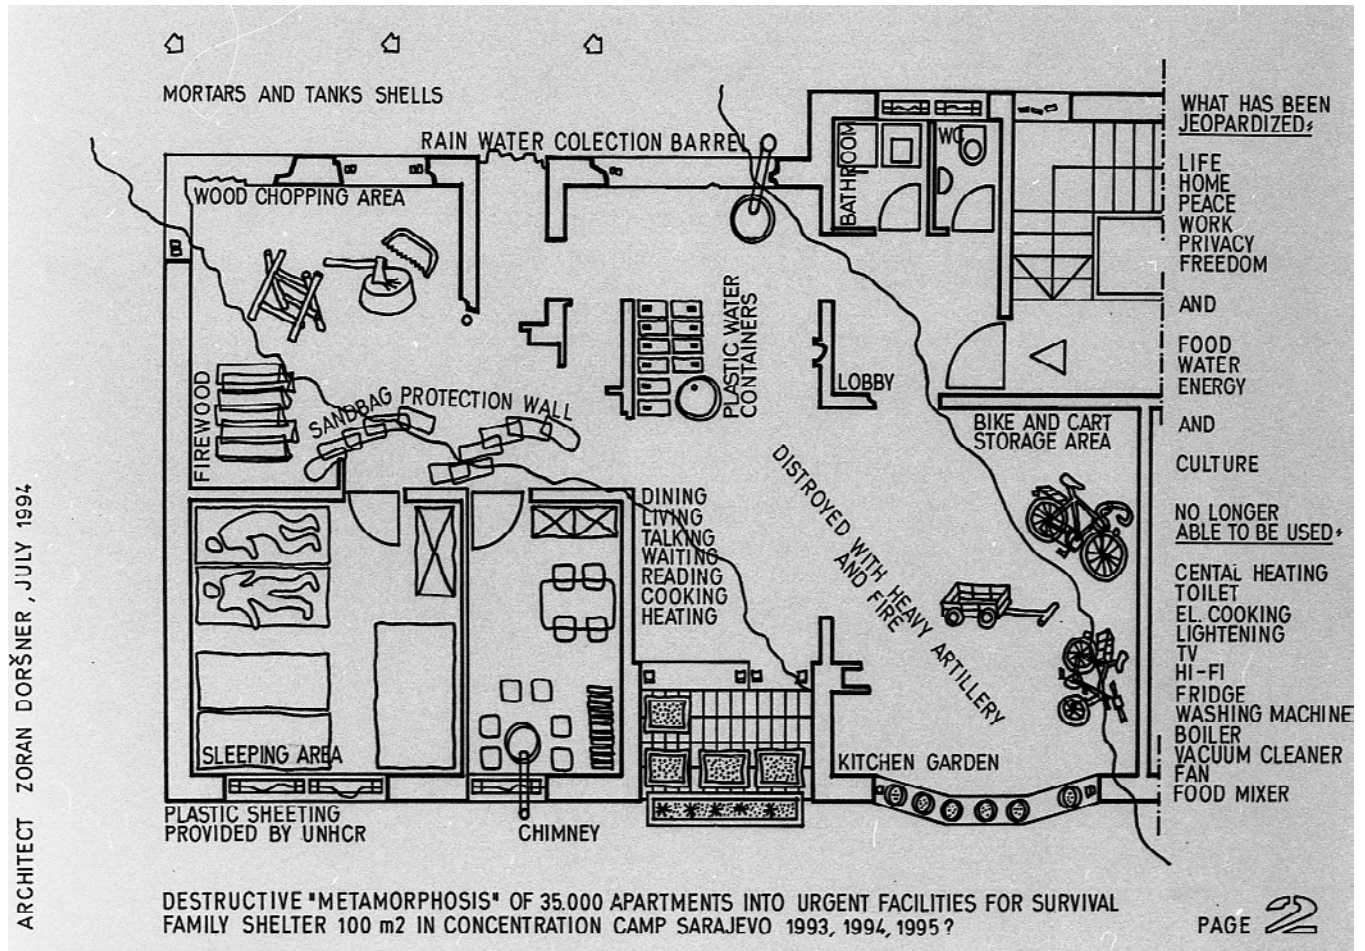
A typical Sarajevo apartment floorplan wartime transformation; Drawing: Zoran Doršner.
